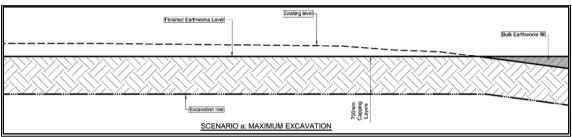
Maximum excavation scenario (source: Walters, 2020)
